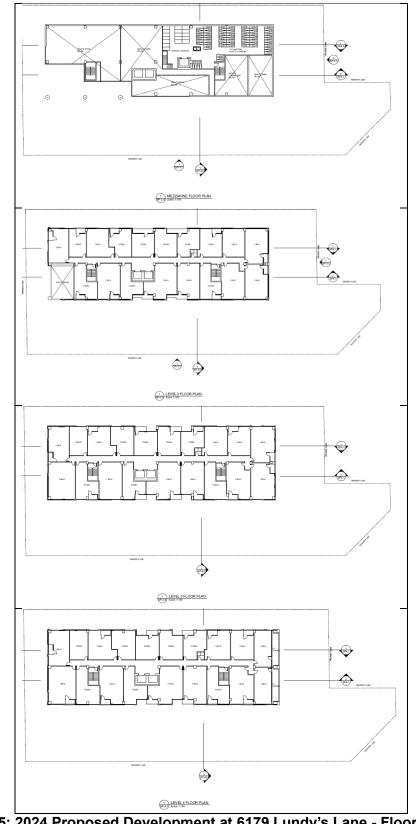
2024 Proposed Development at 6179 Lundy's Lane - Floorplans of Mezzanine – Floor 5 (CY Lee Architects Ltd. 2024a)
